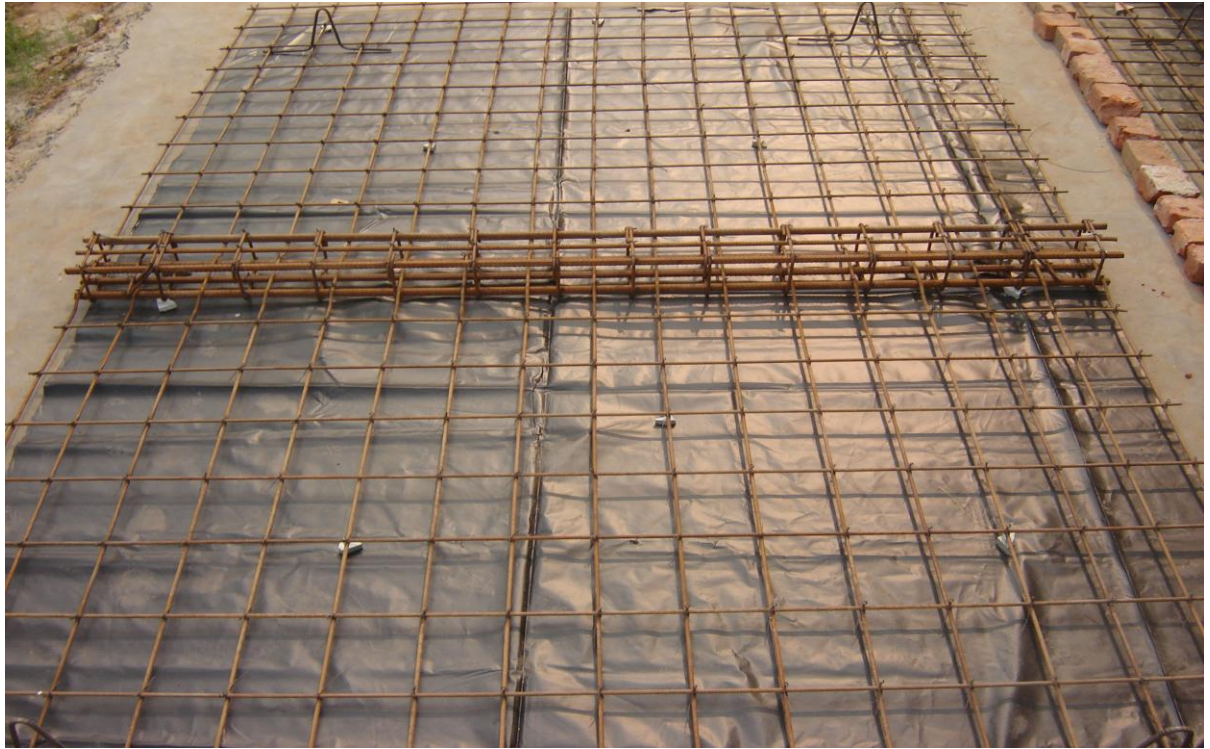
Typical Reinforcement Detailing of 2-panel Slab
